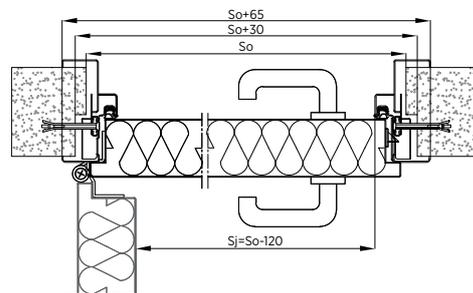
Installation of the single-leaf door to a masonry wall - wrap-around frame with a thermal break - horizontal cross-section
